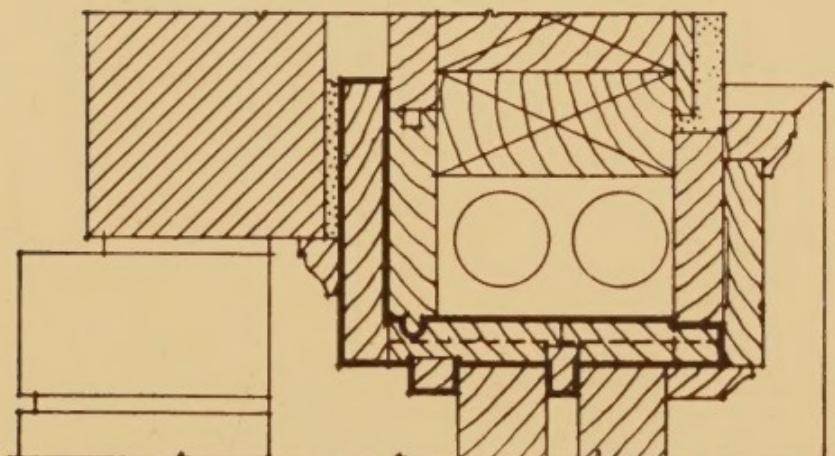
Frame No. 105 converted to a brick veneer frame with standard No. 8535 cove moulding suggested for brick moulding. If brick is to be set closer casing may be ripped down when used with 4 inch D & M blind stop as shown.
